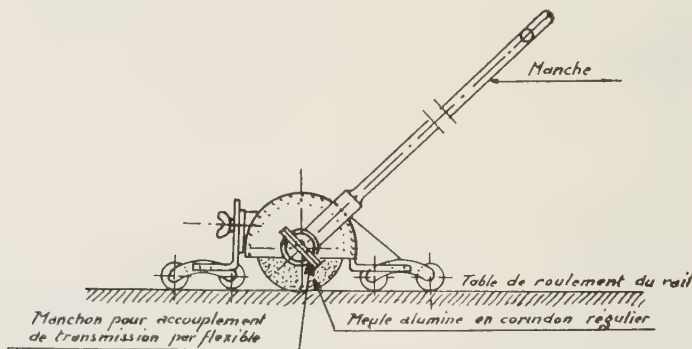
Milling machine for built-up rails (Northern Light Railways).
